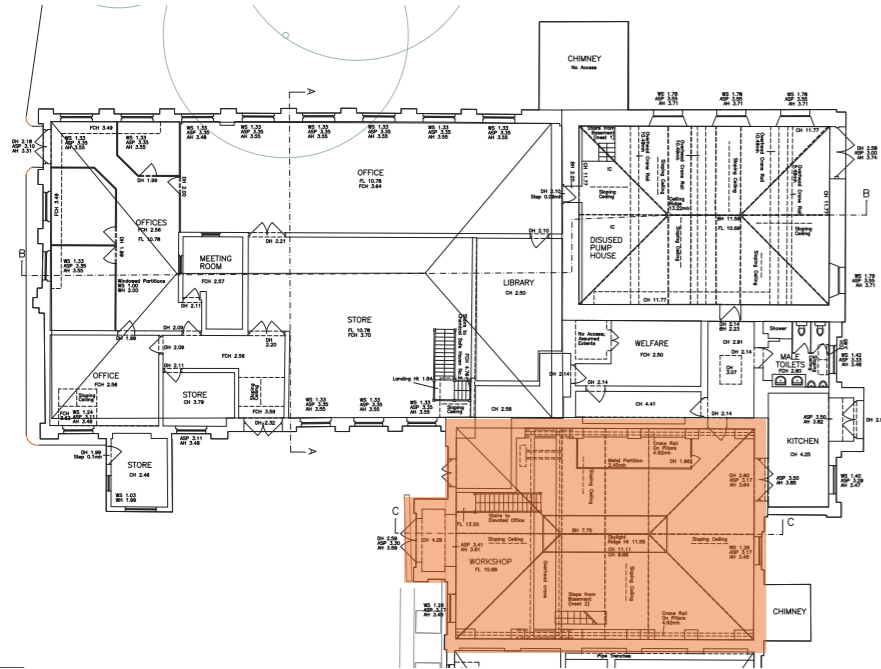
Location Plan: Ruston & Ward Building, former Ruston engine house (originally Sheffield's Boiler House)
